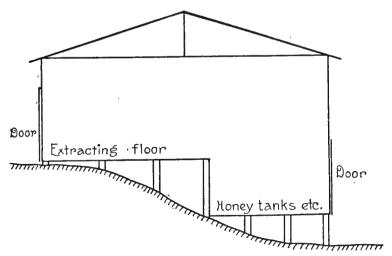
End Elevation of Extracting-house built on a Hillside.
